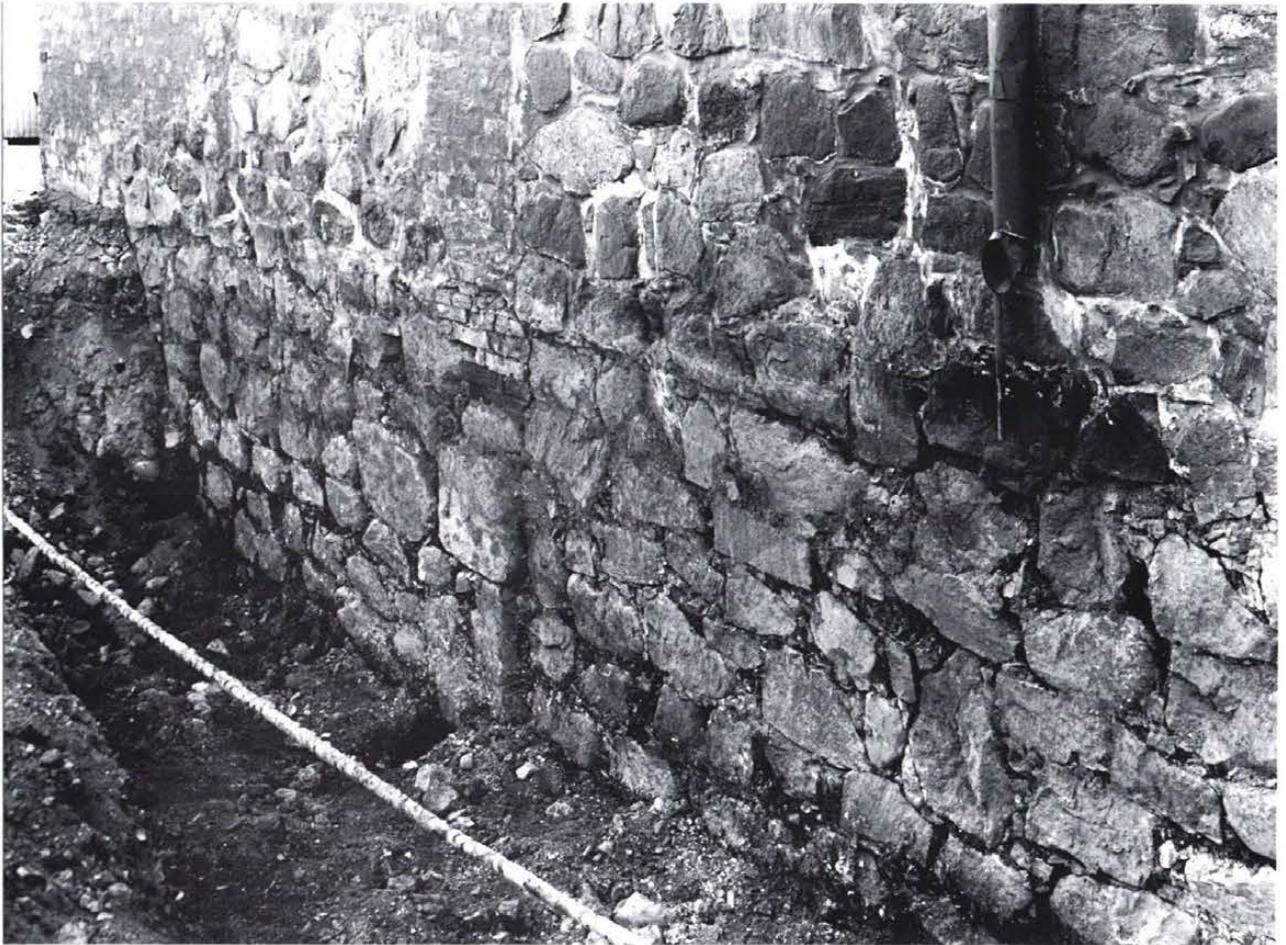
East outer bailey of Turku Castle. There is a distinct structural joint between the northeast tower (left) and the north wall (right), showing that the north wall was built to adjoin the older tower. (Archives of the Department of Monuments and Sites. Turku Castle).
